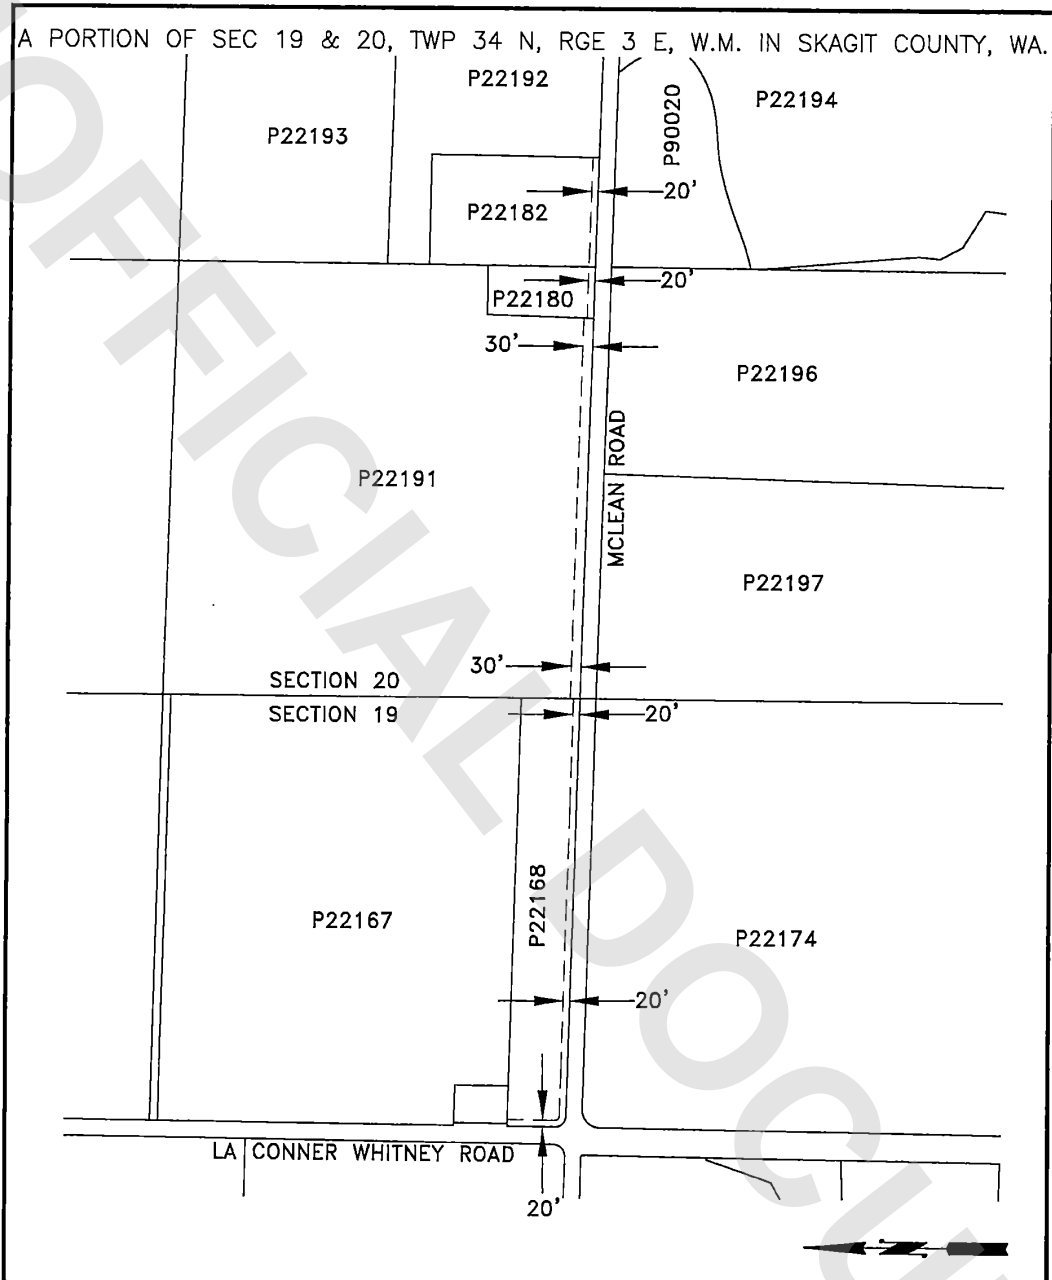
EXHIBIT "B" TOWN OF LA CONNER WATER EASEMENT LEGAL DESCRIPTION	 CHS ENGINEERS	12507 Bel-Red RD., Suite 101, Bellevue, WA 98005 www.chsengineers.com Ph: 425-637-3693	Scale 1" = 500'
